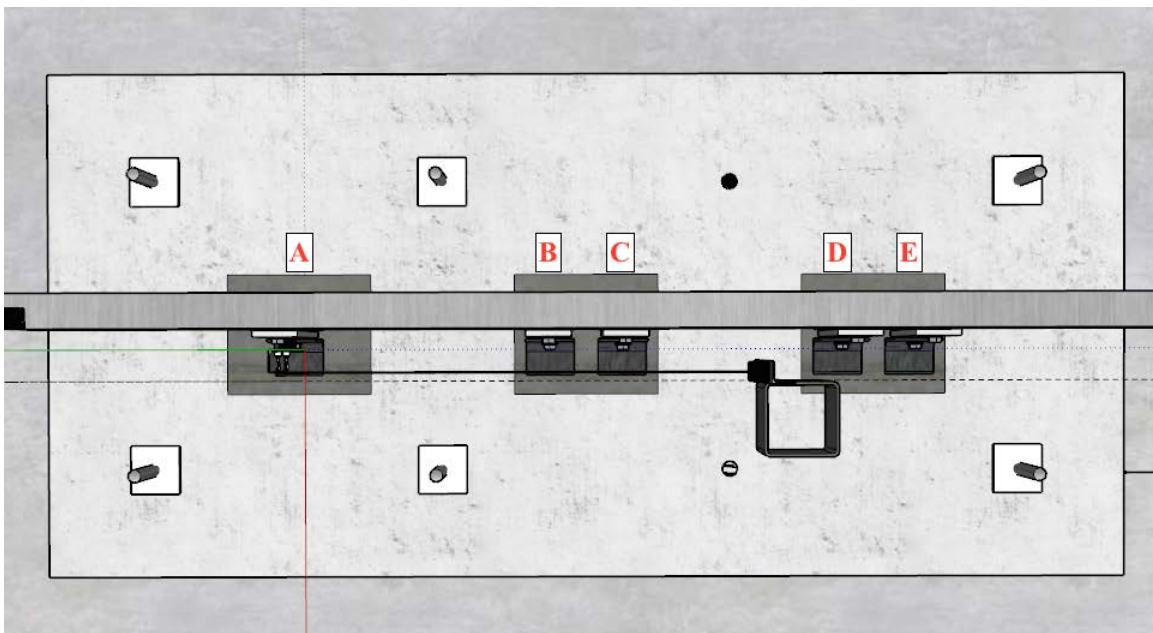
Plan View of Test Panel with Locations of Connections Tested (Sellers 2017)
